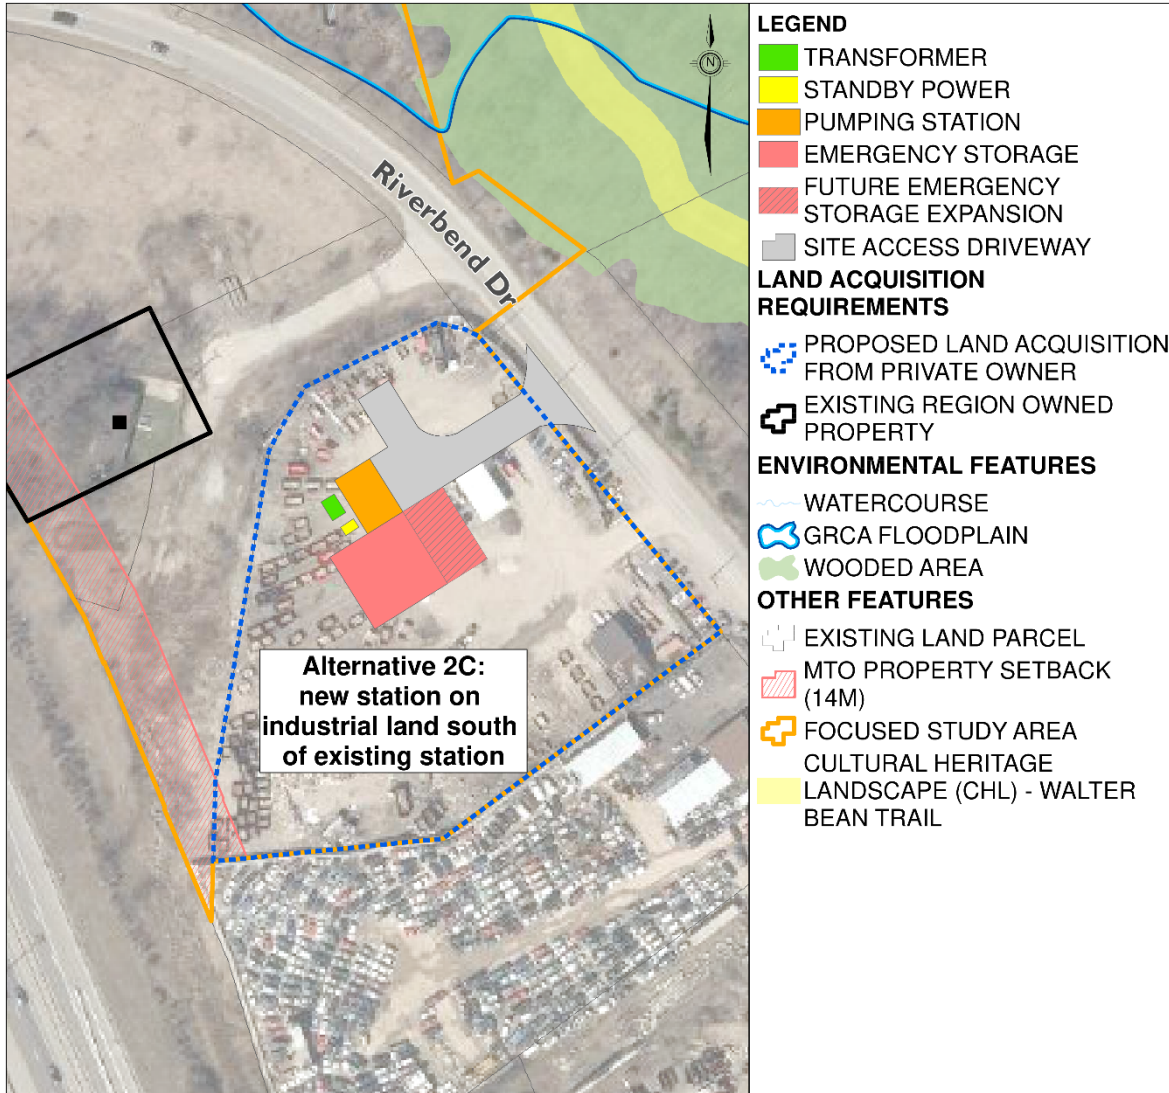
Alternative 2C: New Station on Industrial Land South of Existing Station
